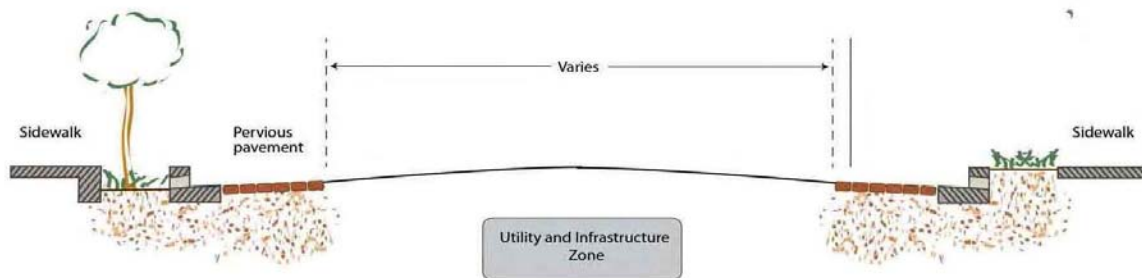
Possible pervious pavement design layout (*Model for Living Streets Design Manual, 2011*).
